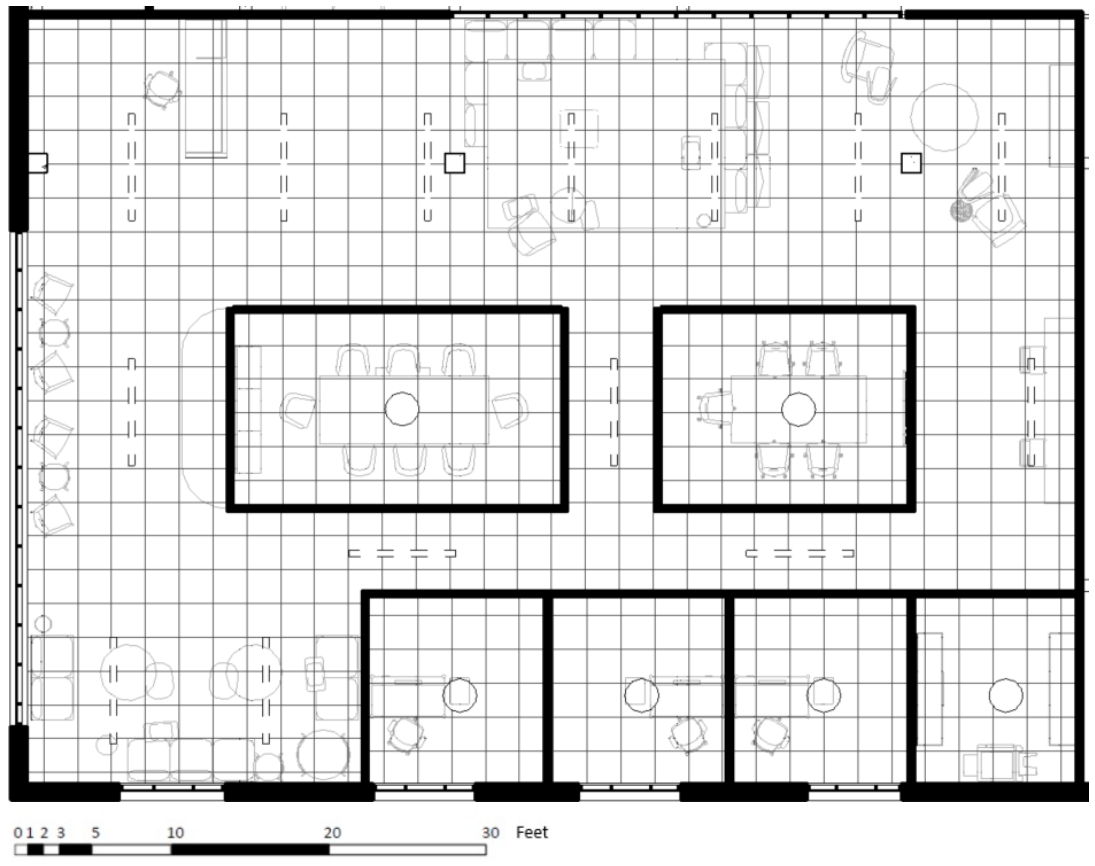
Proposed Work Lounge Floor Plan (Wood, 2023)
